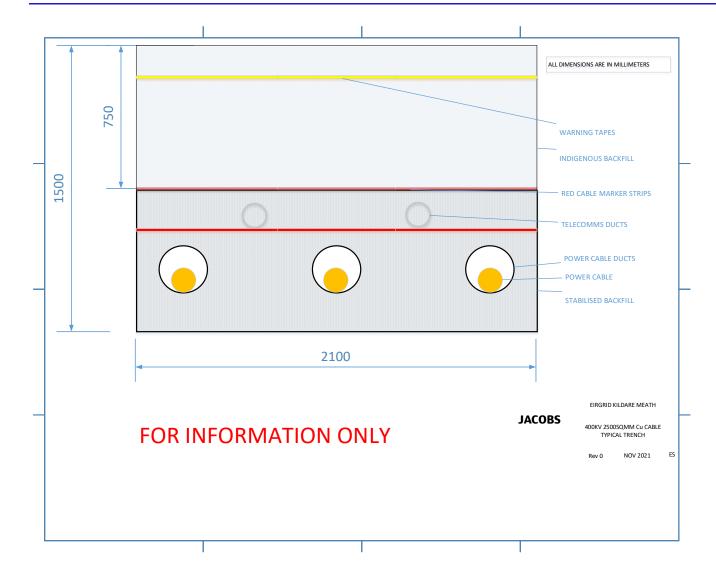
Preliminary typical trench cross-section for 400 kV 2500sqmm Cu solution. Trench width 2100mm.
